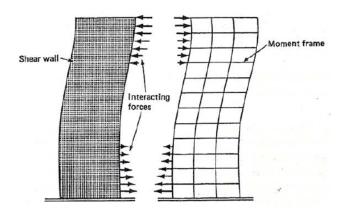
Wall-frame Interaction (Taken from Lateral Load Design of Tall Buildings)
